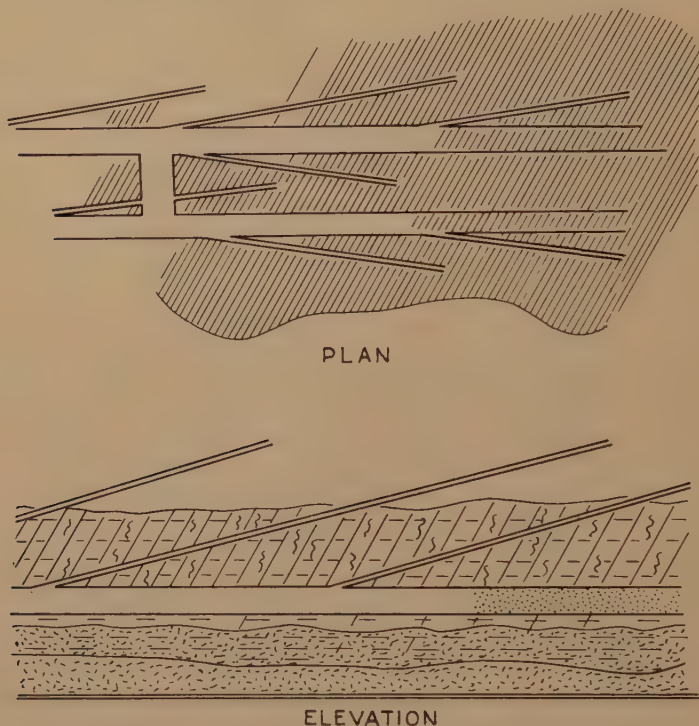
PROPOSED SHAFT DIAMOND DRILL HOLE PATTERN.
